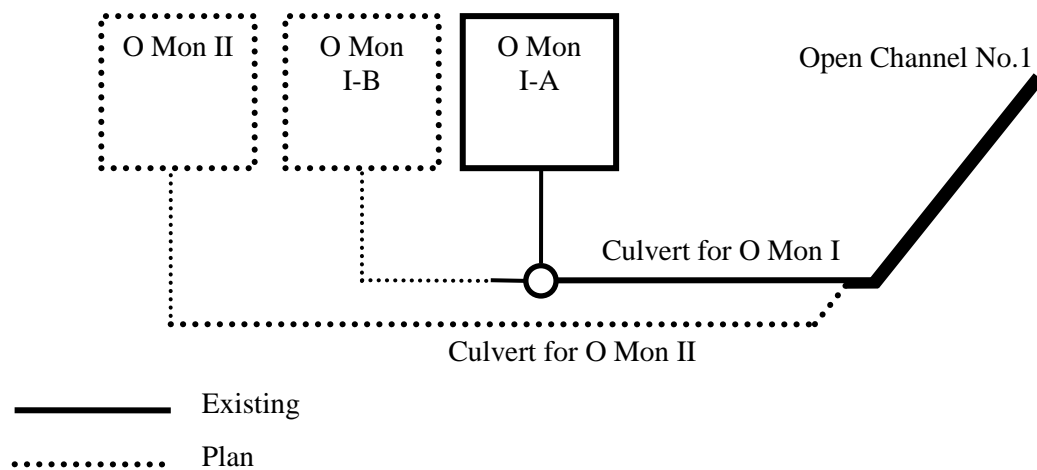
Layout Plan of CW Discharge Channel
